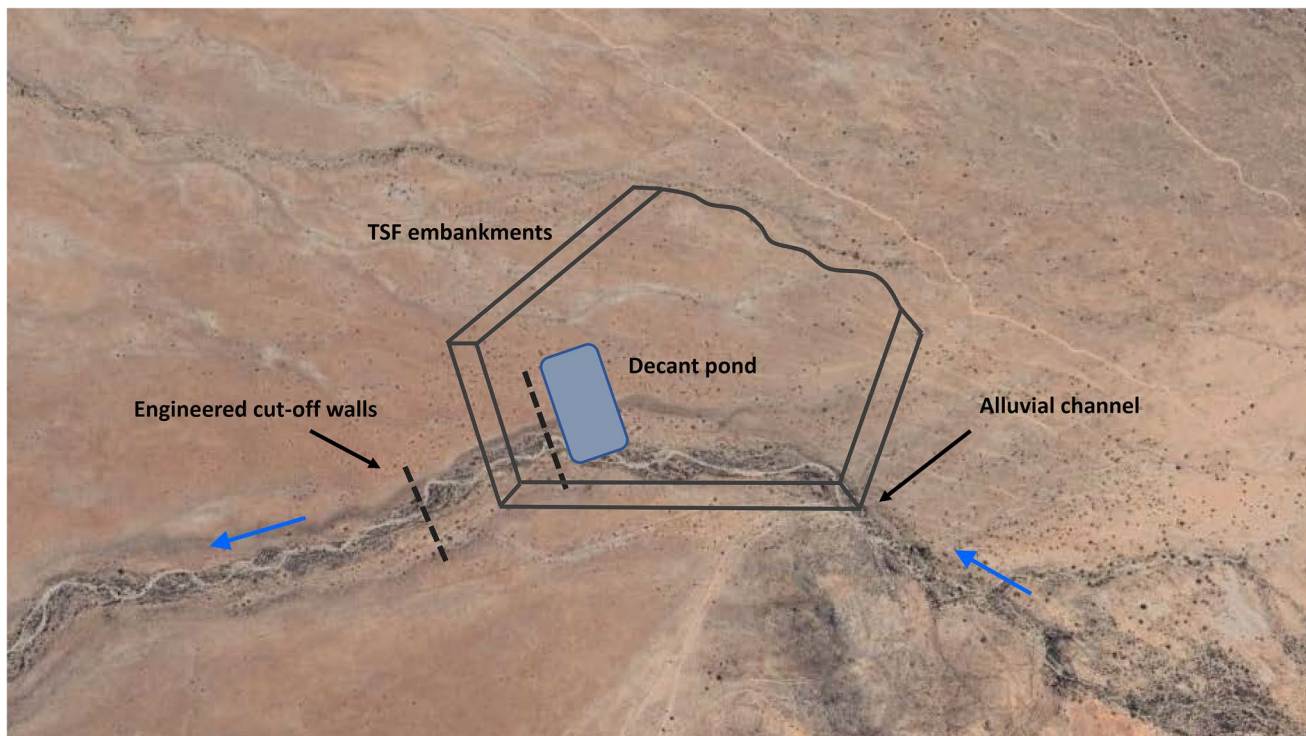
Schematic showing plan view configuration of TSF embankments, alluvial channel, and engineered structures. Blue arrows represent natural surface water/shallow groundwater flow prior to construction
